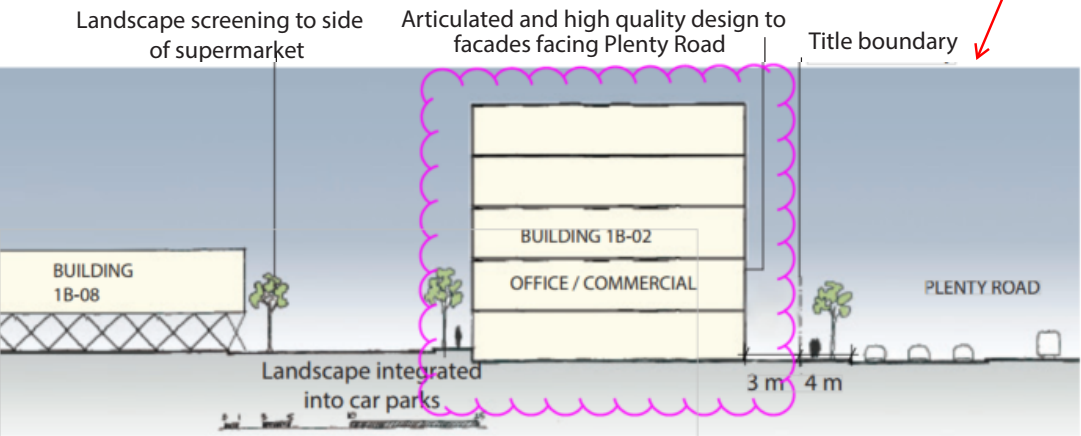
Indicative Section through buildings fronting onto Plenty Road
